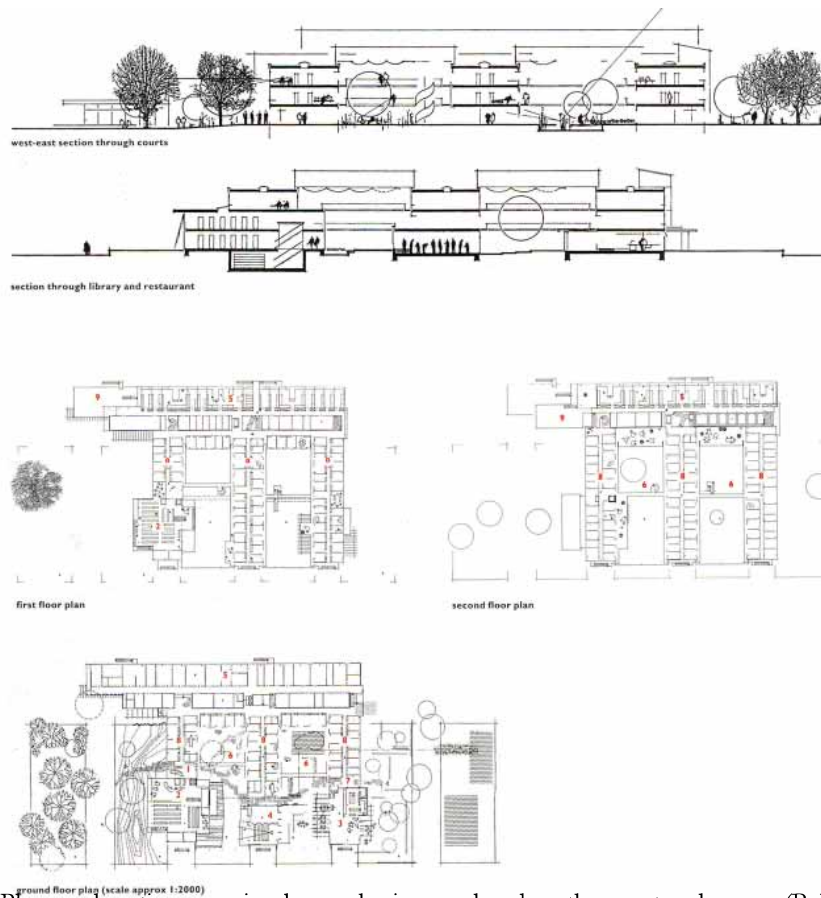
Plans and sections are simple, emphasis was placed on the courtyard spaces (Behnisch, 2000: 18)
